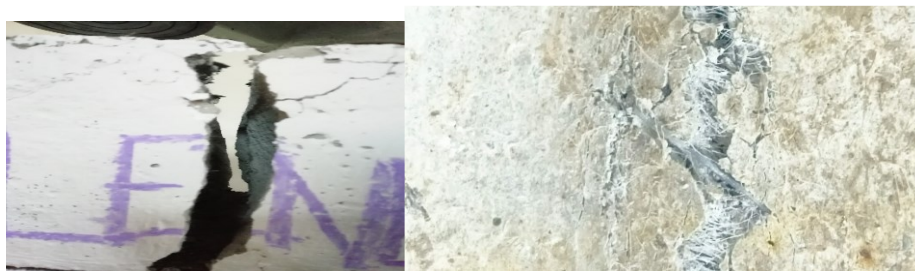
Crack width of concrete (a) without fibres and (b) bridging of crack in fibre-reinforced concrete
